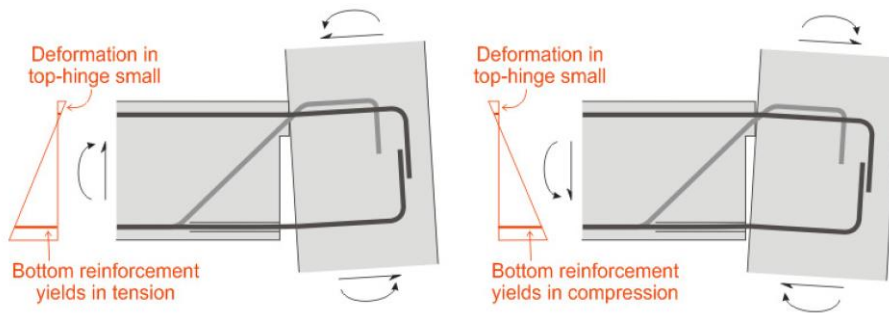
Slotted reinforced concrete beam showing how the beam rotation is accommodated via opening and closing of slot (Au 2010)
